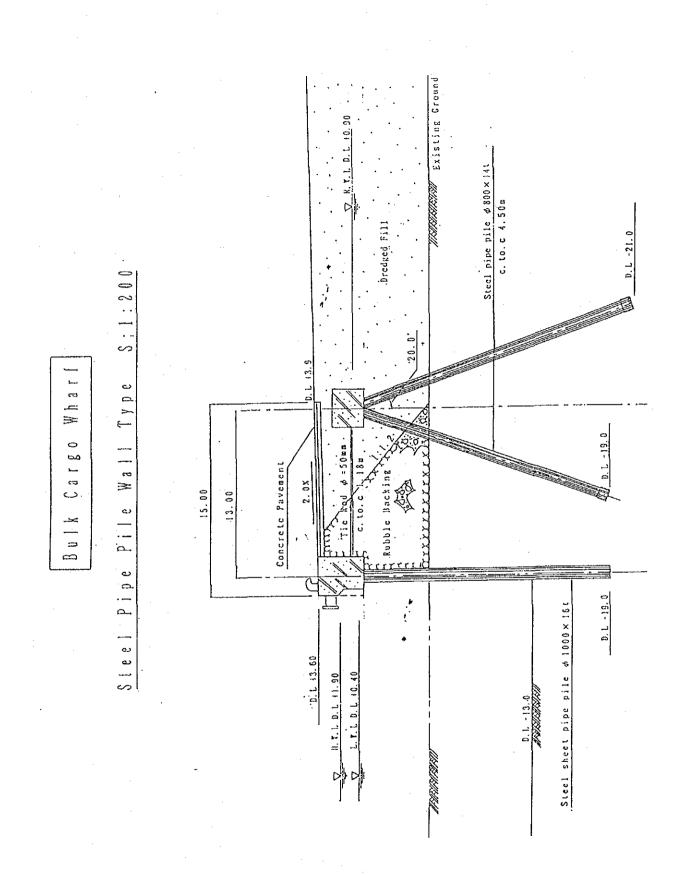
Steel Pipe Pile Wall Type for Bulk Cargo Quaywall
